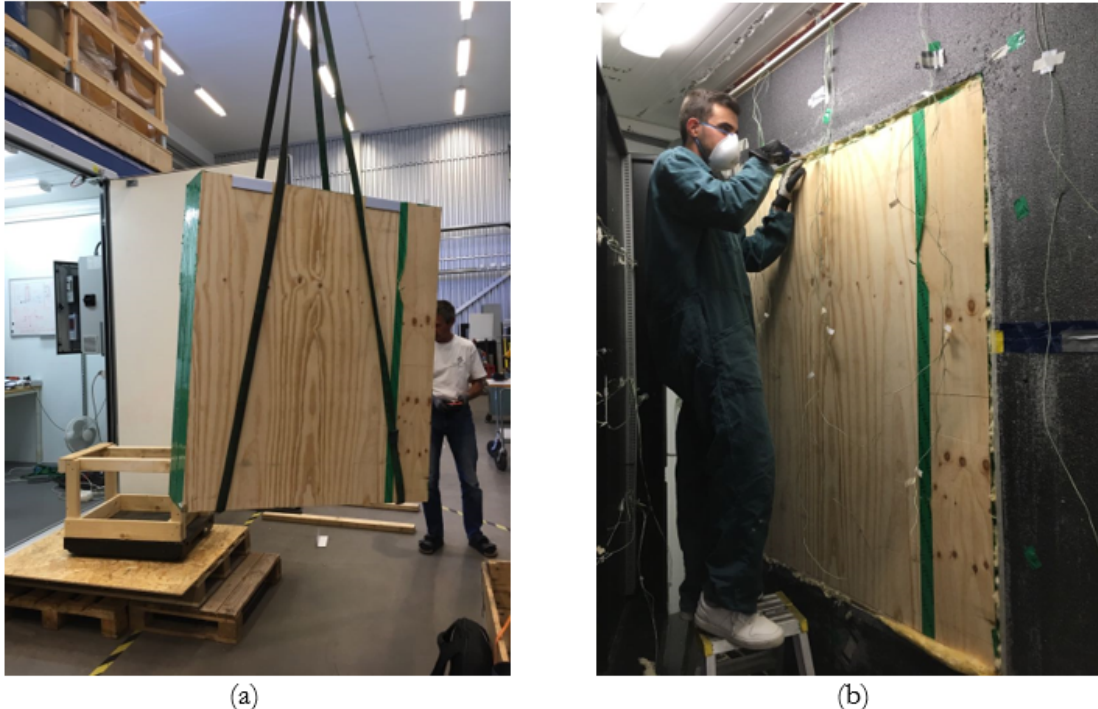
(a) lifter is used to carry the timber wall and place it on mobile surface, (b) mineral wool is stuffed at the boundary between the surround wall and the wall specimen.
